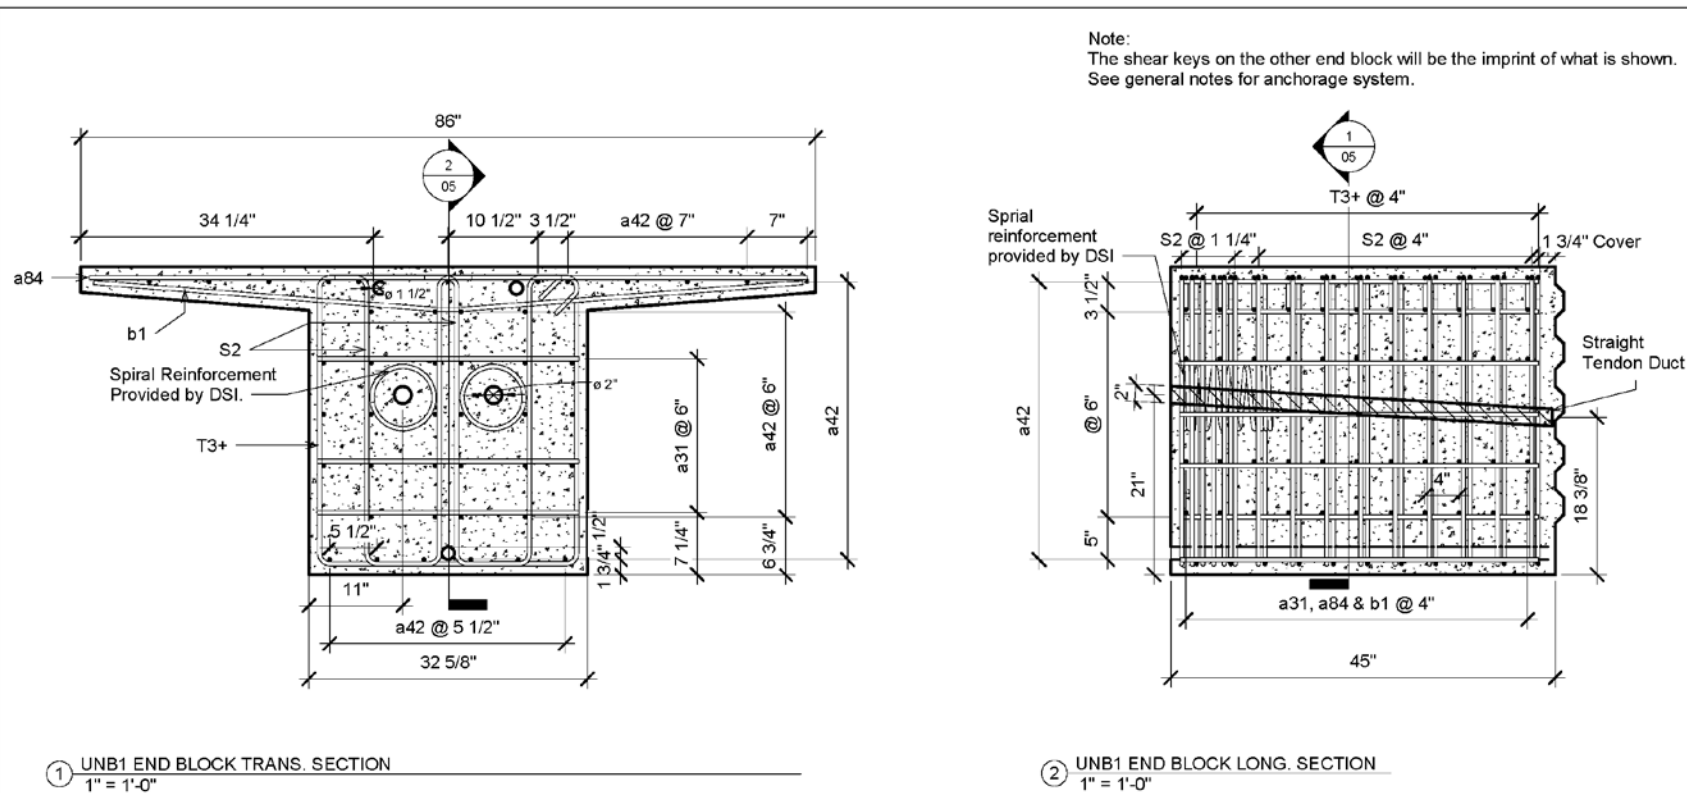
UNB1 End Block Longitudinal and Transverse Section
